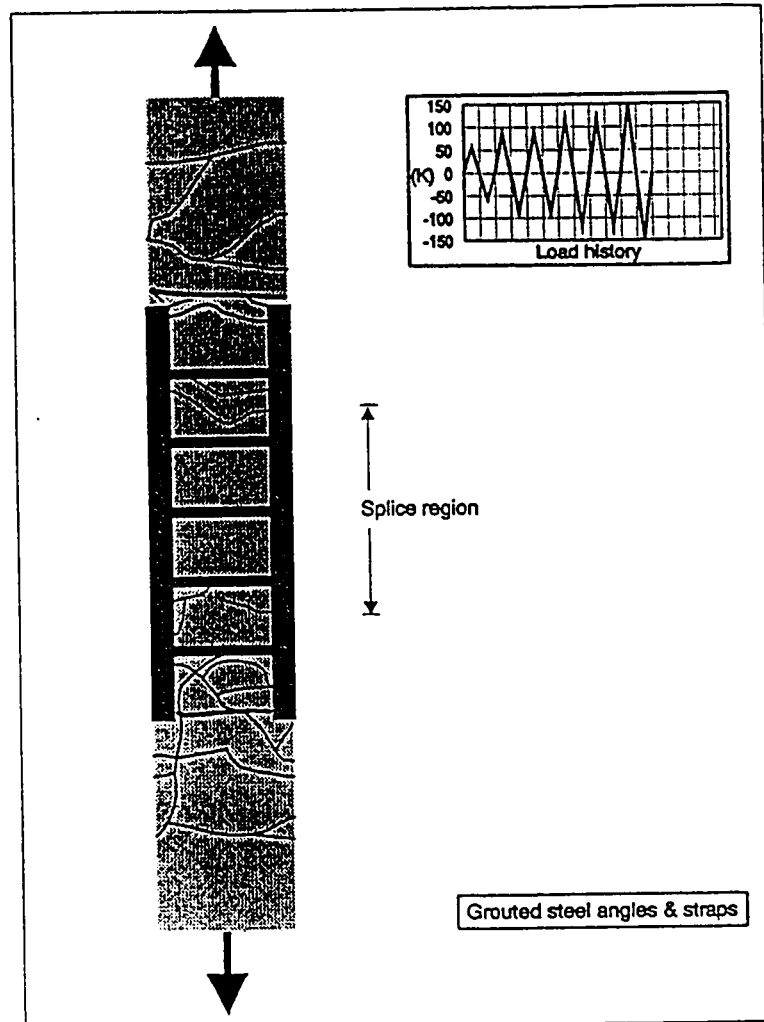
Strengthening of Columns With Inadequate Lap Splices, Crack Pattern in the Retrofitted Column, Ref.[23].
